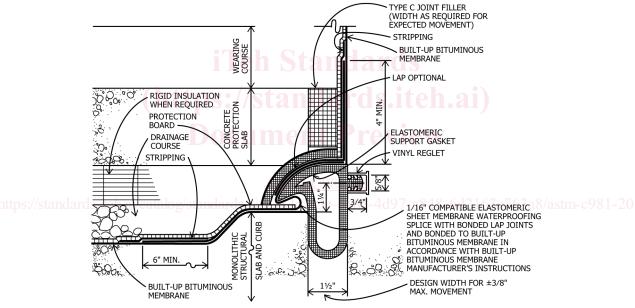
Water Shed Concept Expansion Joint (see also 8.8.7.2 and Fig. 5 for Easier Gasket Installation Detail)easier gasket installation detail)
